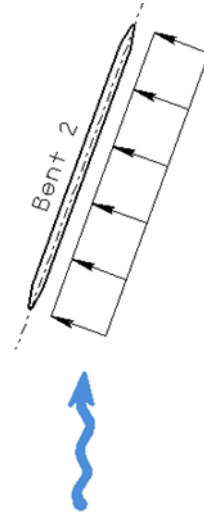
Transverse to Pier Forces due to Stream Flow
